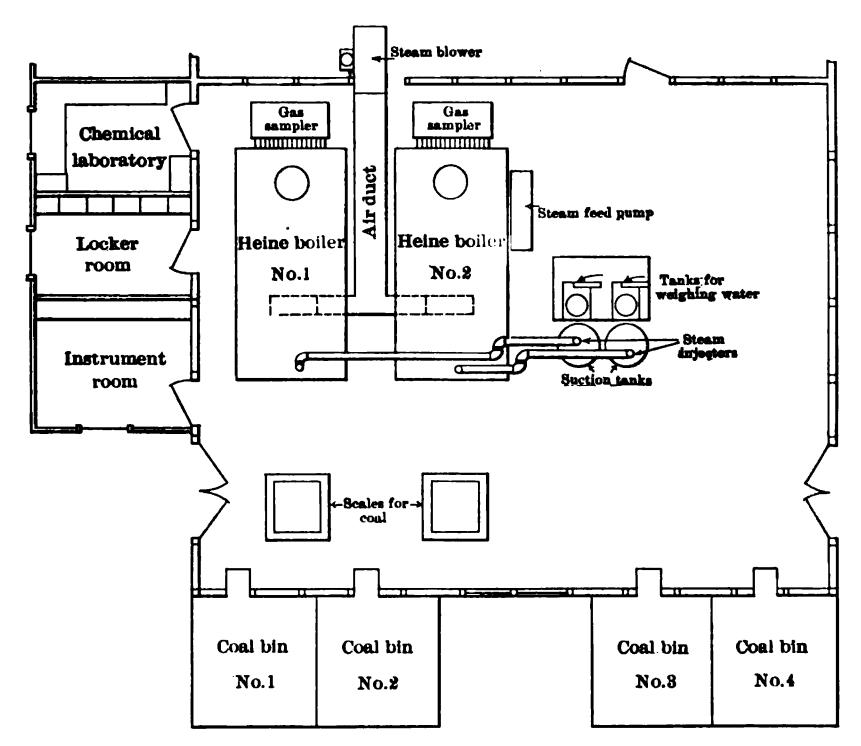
Plan of improved steam plant at St. Louis, Mo.
